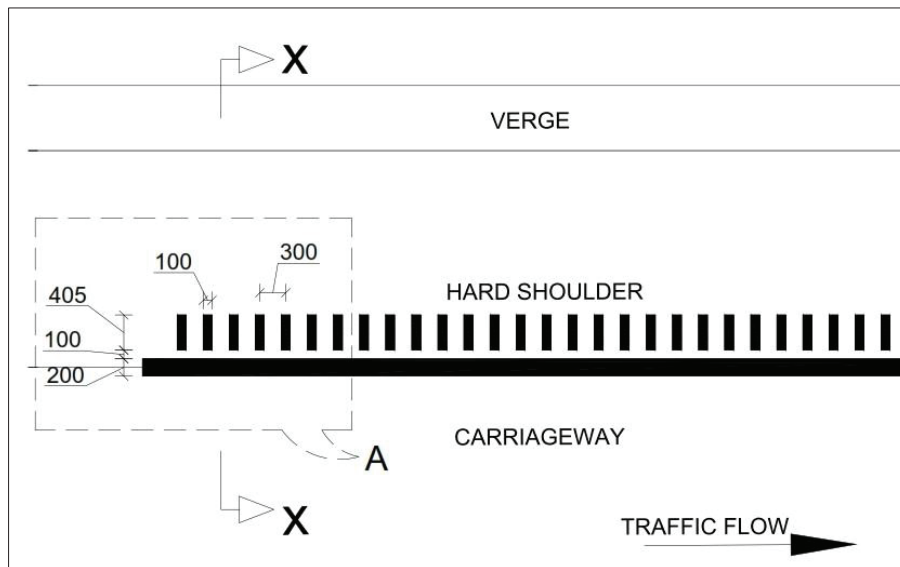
SNAP Marking - Shoulder Rumble Strip Plan
